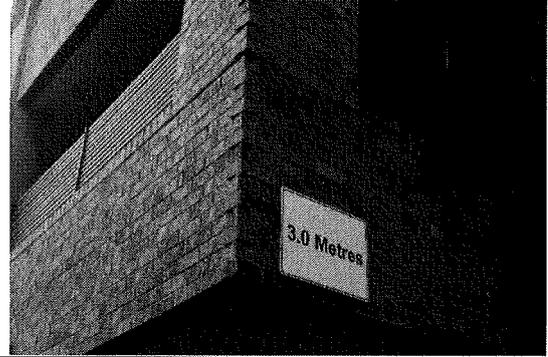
impact damage to cantilevered slab and masonry over.
